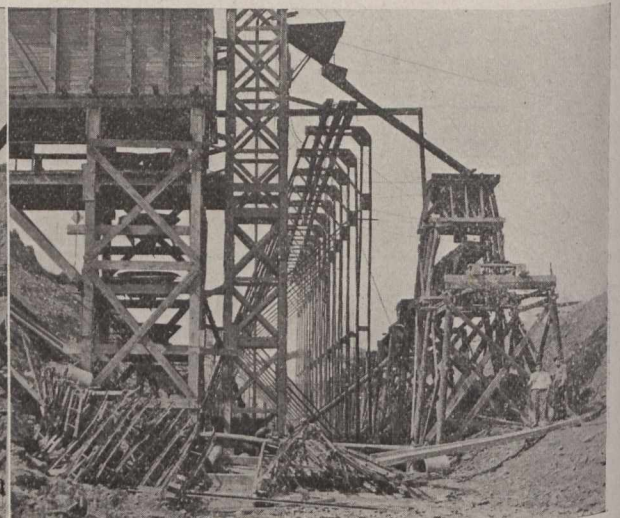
Part of the Concreting Plant at the South End of the Retaining Wall.
